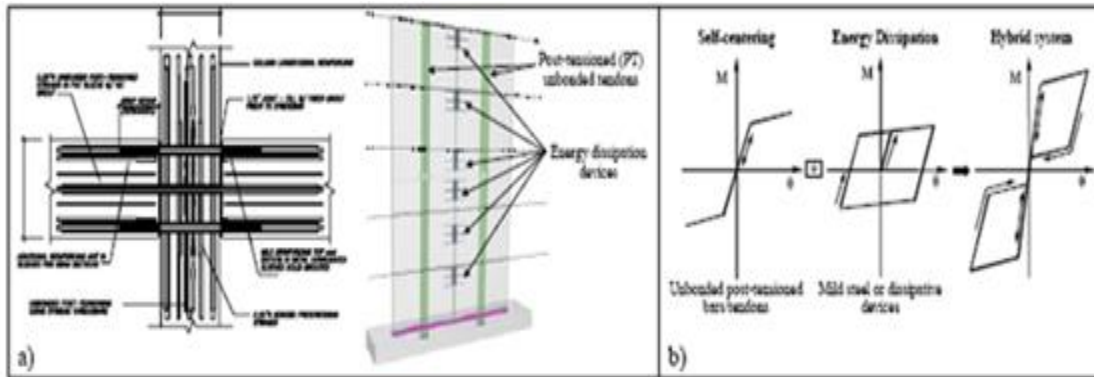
Hybrid solutions for precast concrete frame and wall system.
